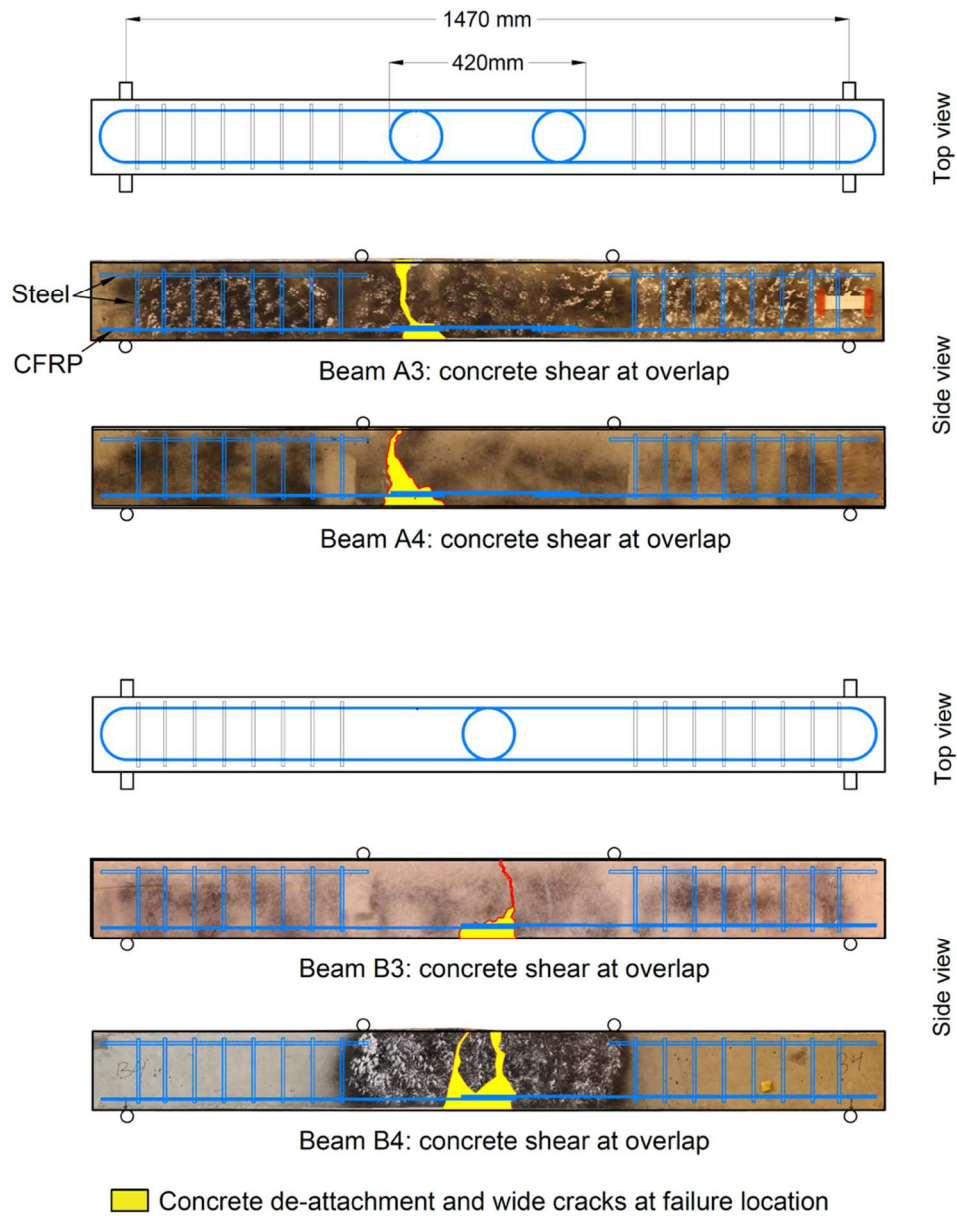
Failure zone and mechanism for beam specimens with CFRP loops at elevated temperatures.
